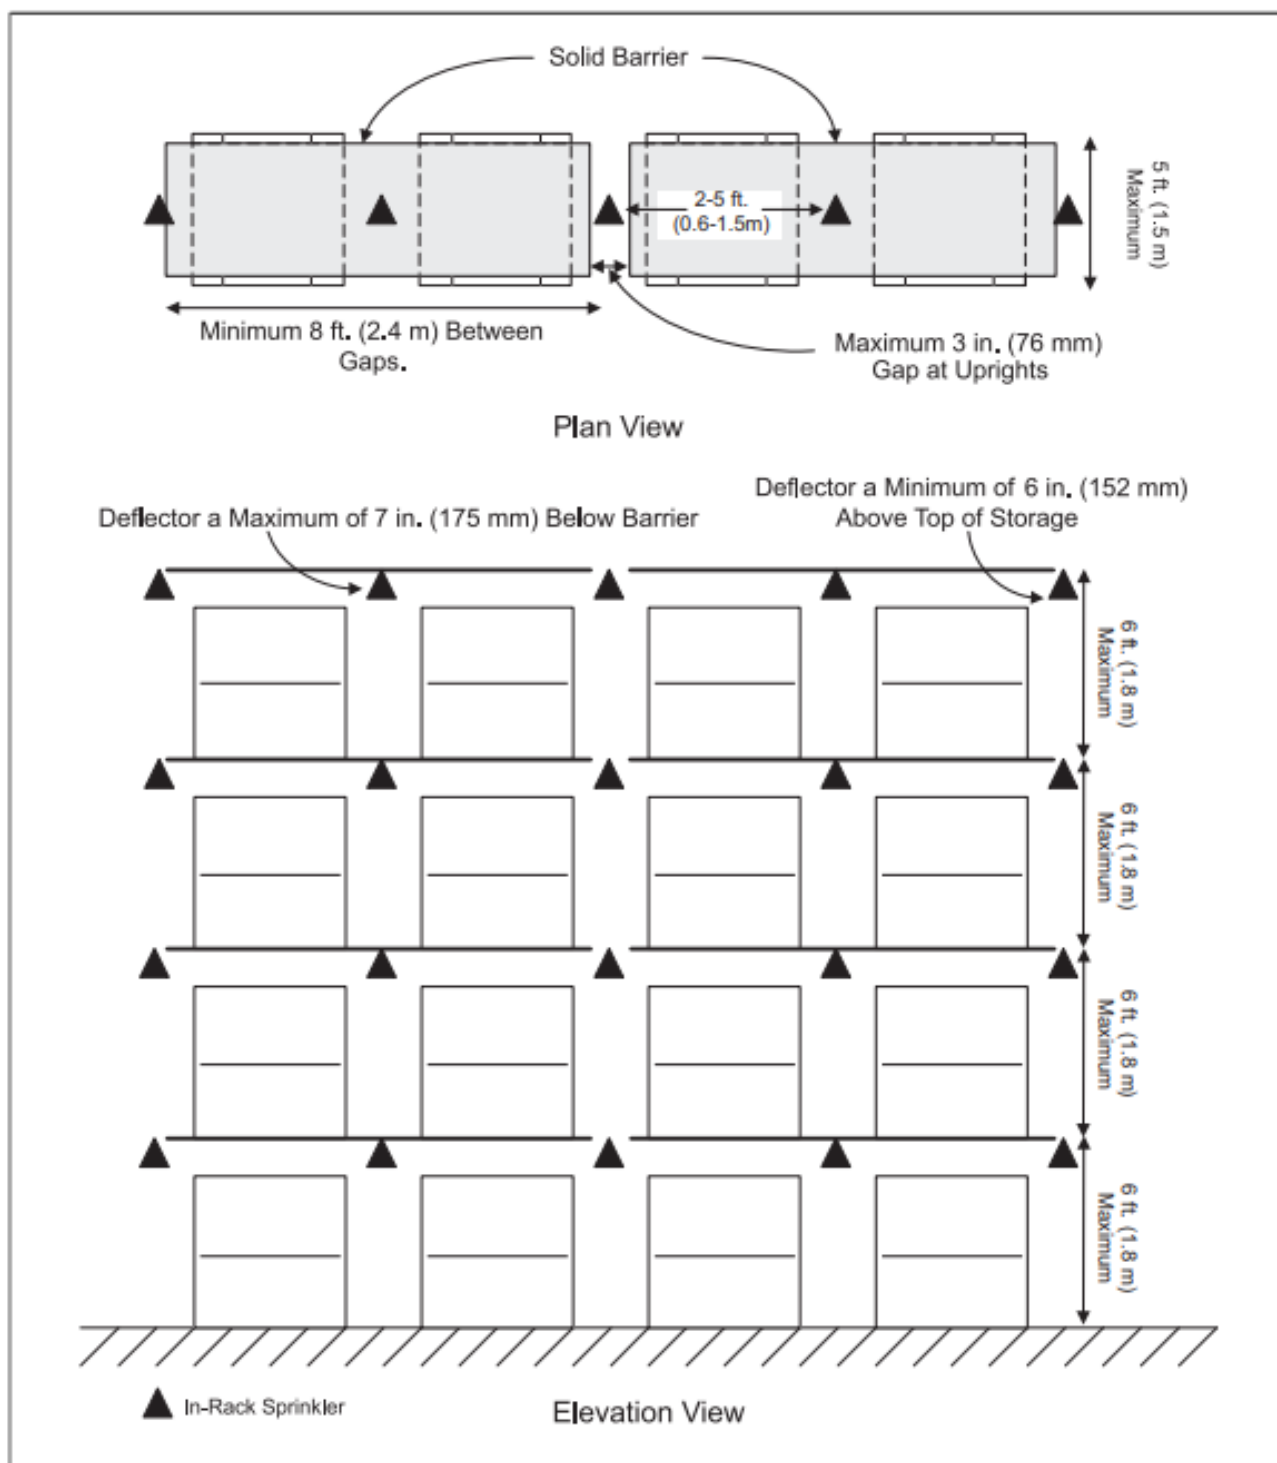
Single-row rack in-rack sprinkler layout for li-ion cells/modules/batteries
